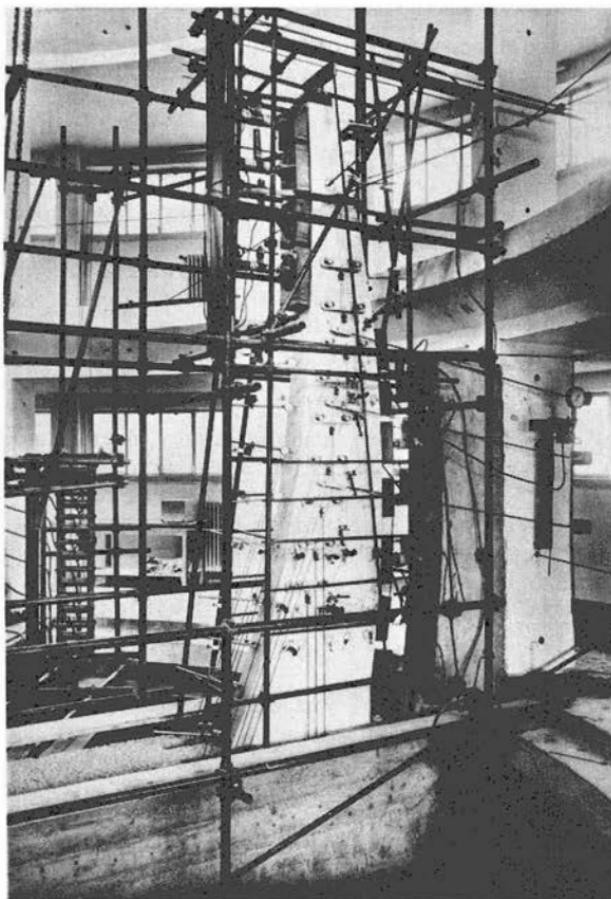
Testing of a Single Cantilever Model of a High Arch Dam Designed for Construction in Two Steps with a Longitudinal Joint.
